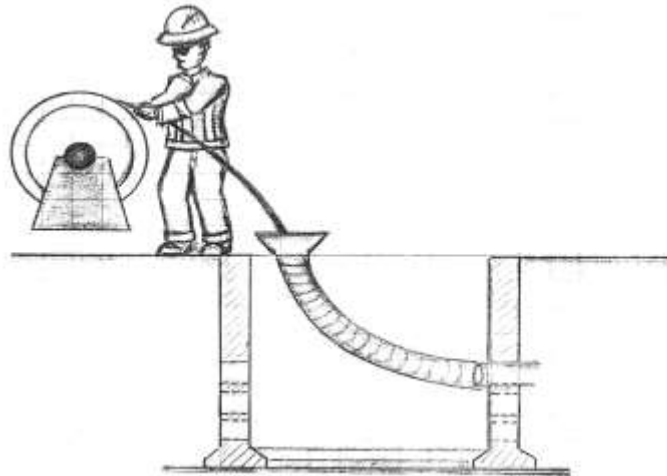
Reel End Setup for Polymer cable – Transformer Base
